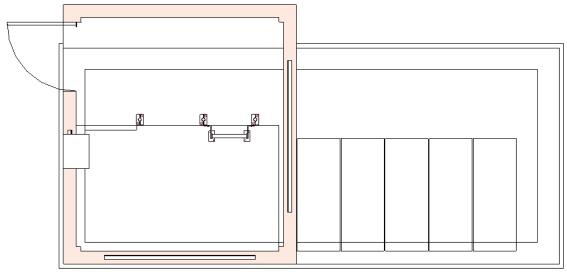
2D hidden line visual style plan model produced for element DS in REVIT.
